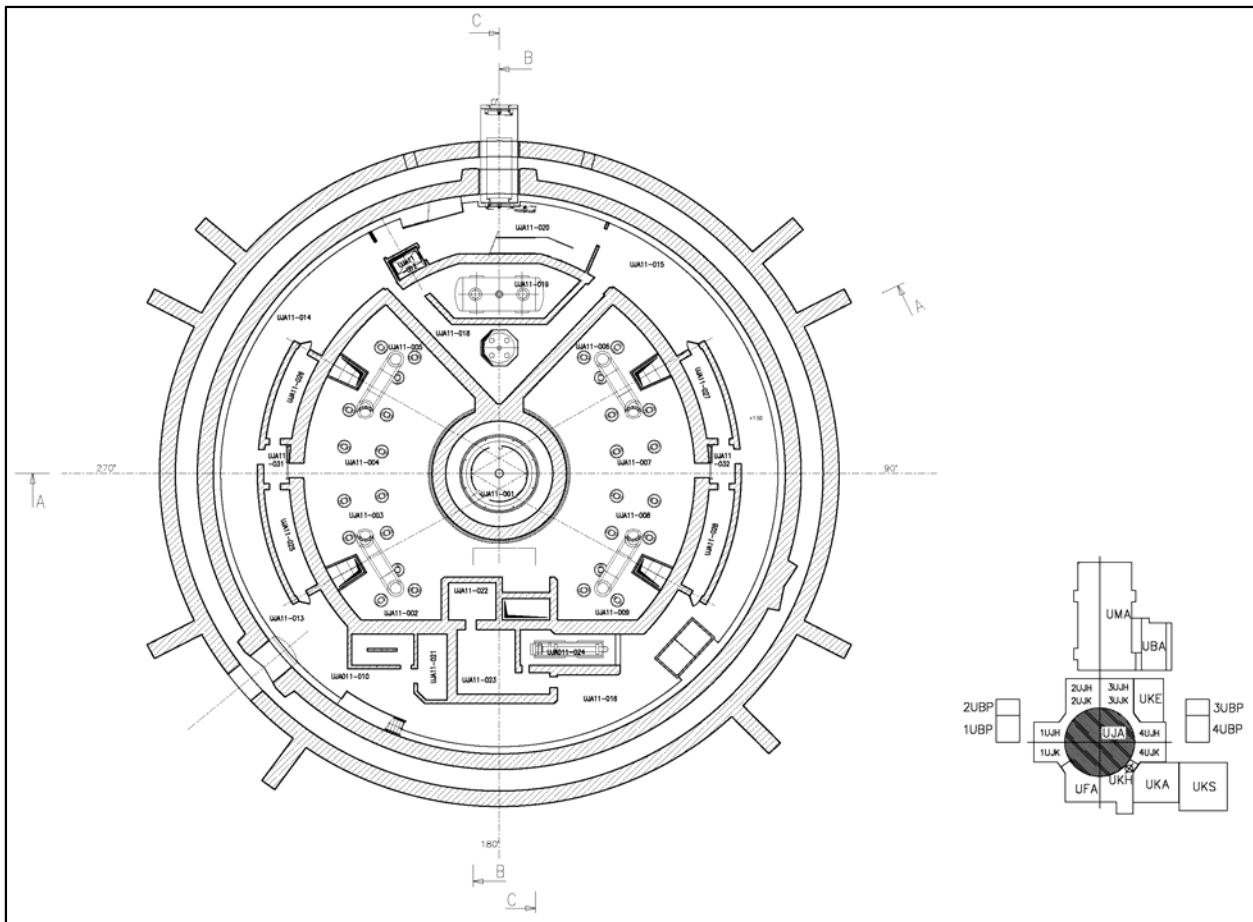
6: REACTOR BUILDING PLAN VIEW +5 M
